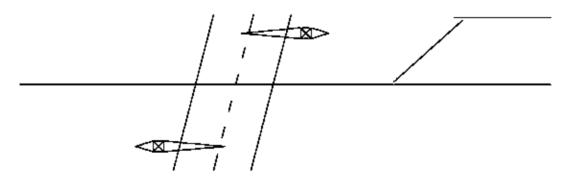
LIFTING BARRIERS – HALF BARRIER TYPE
